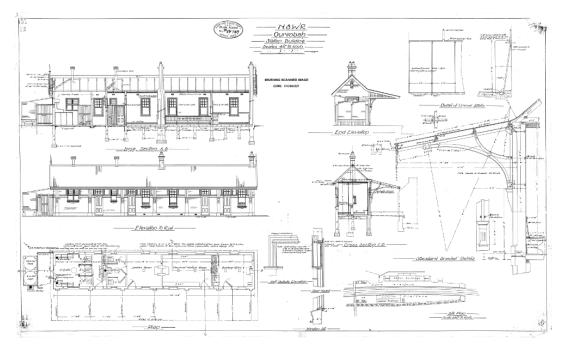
Image of the Platform 1 building plans, c1910. Source: Sydney Trains Plans Room
